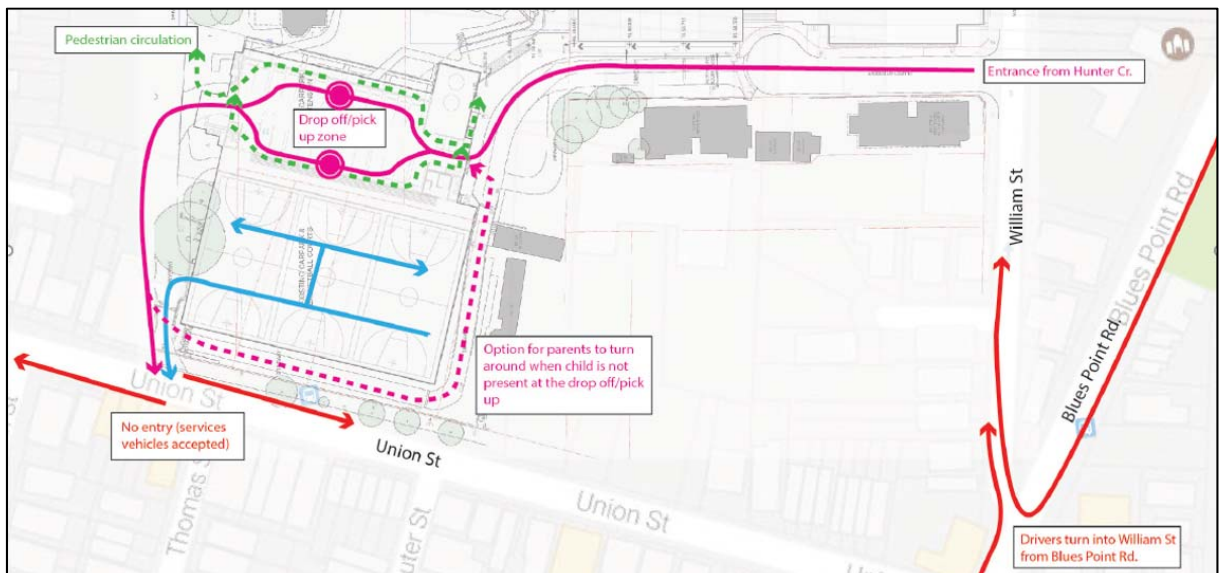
Proposed drop-off/pick-up facility (Source RtS Addendum)
